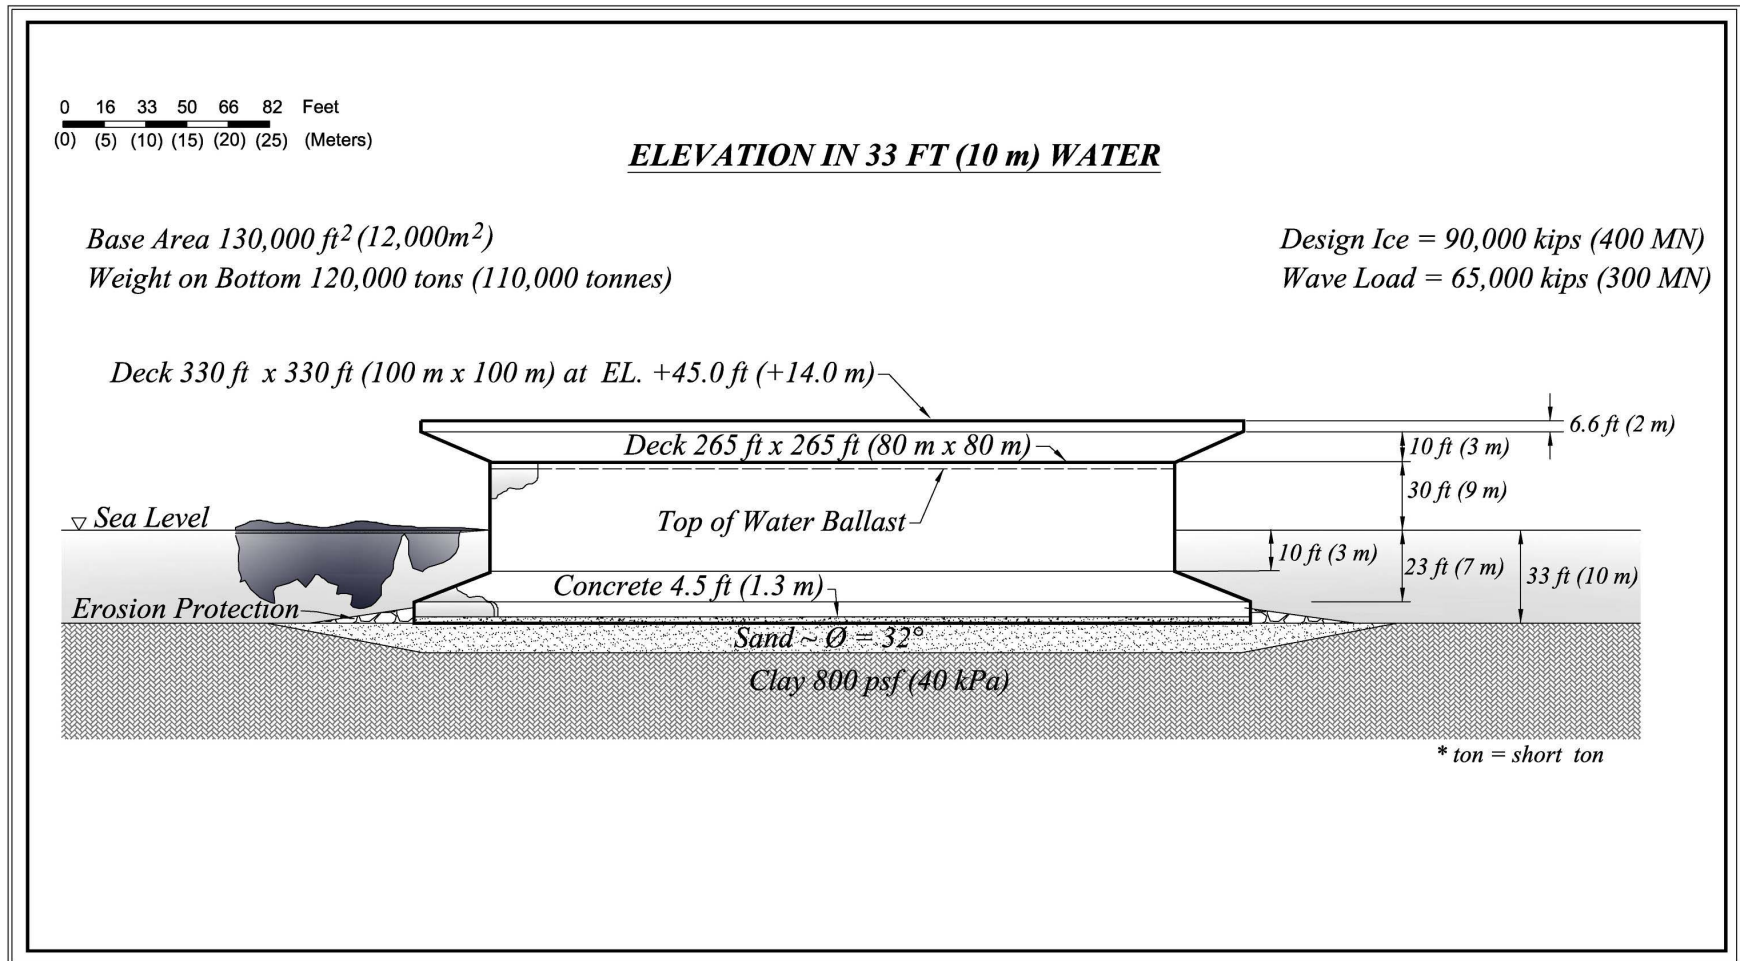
Drawing No.1, Option No.1 – Platform and Foundation for 33 ft (10 m) of Water
